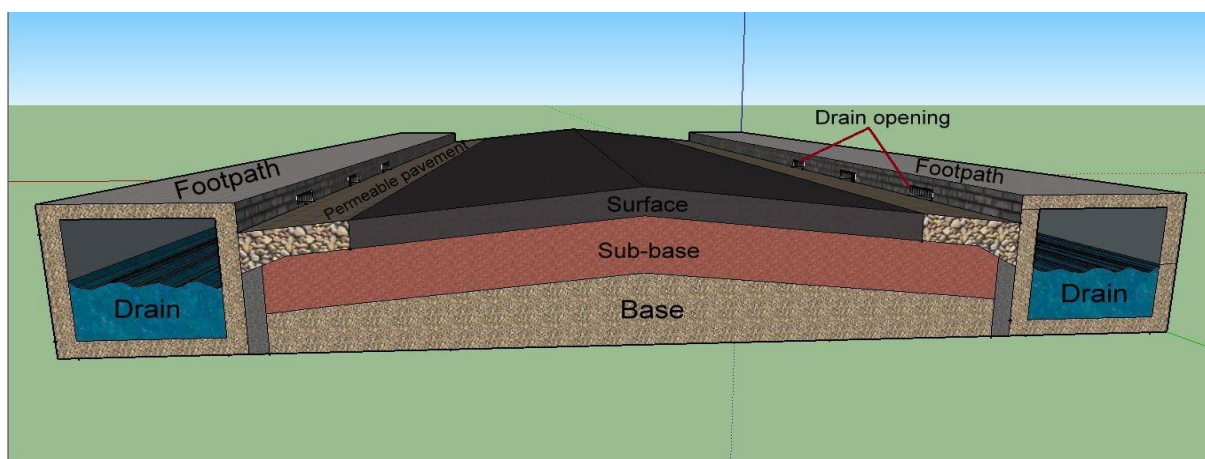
Proposed cross-section of a road pavement along with permeable pavement & surface drainage system
